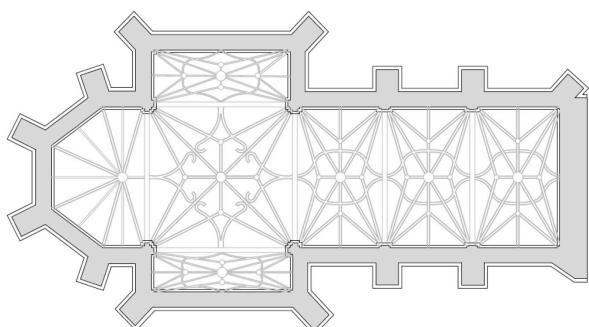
Proposal for the original floor plan and projection of the vaults. Drawing: Mireya Ibarra Pérez.
